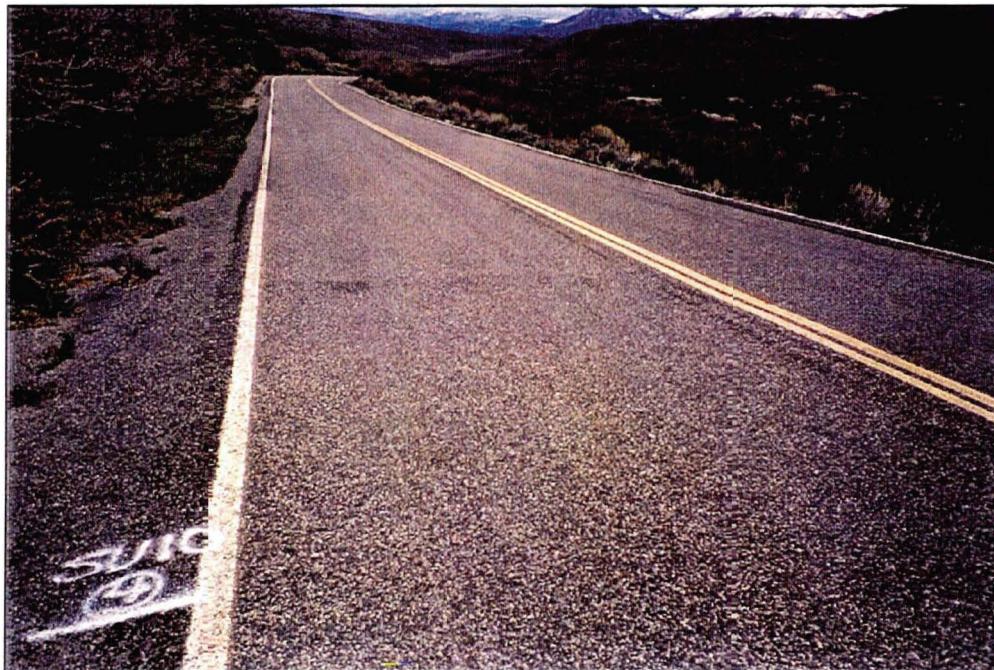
Section 4, Sample Unit 10 (MP 3.12)
